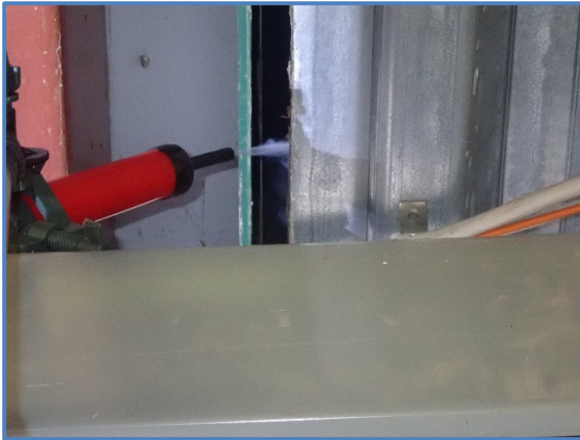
Where the Pod transitions to the main building there is an expansion joint; synthetic smoke rushing inwards demonstrates this area to be an air leakage site.
